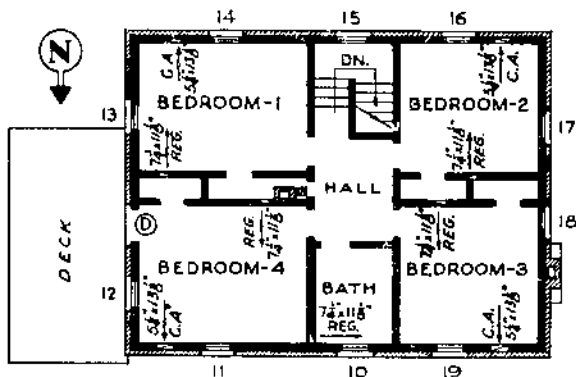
Second-floor plan of house No. 6-N, showing location of warm-air registers and cold-air returns.
